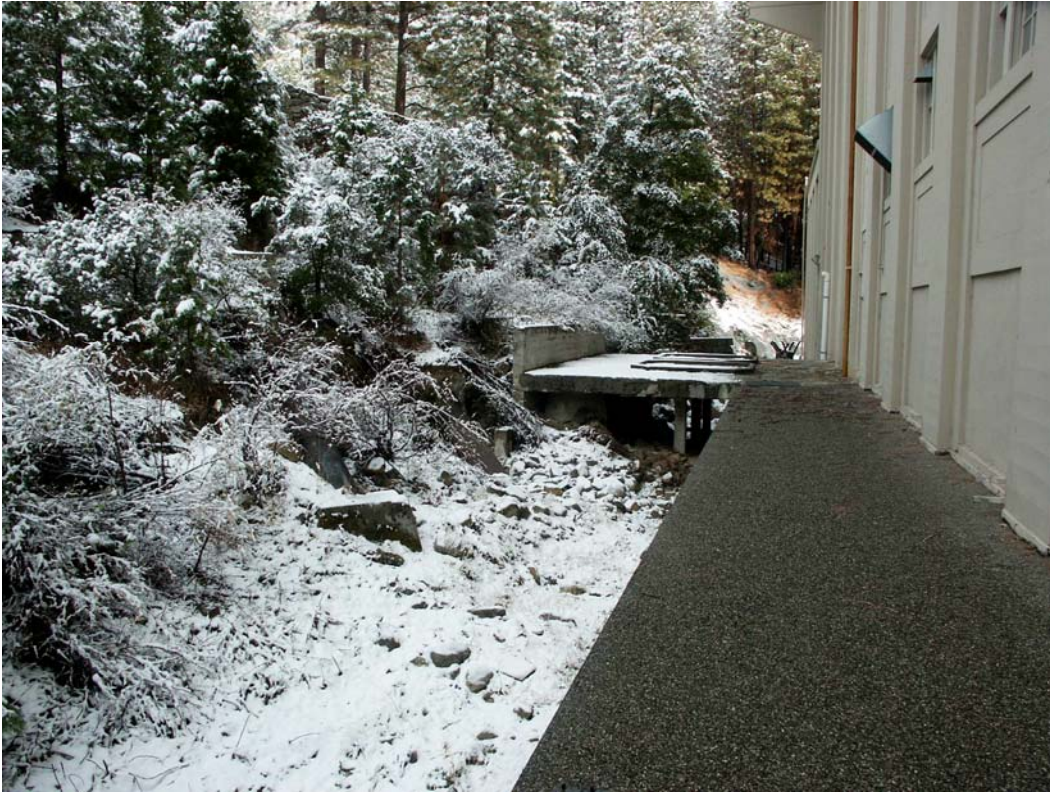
Powerhouse No. 1. This photograph taken behind the powerhouse shows the defensible space area immediately adjacent to the structure which is cleared of brush and woody debris. Trees adjacent to the building have been limbed back to provide a defensible space and the building is of concrete construction providing very good fire protection.
